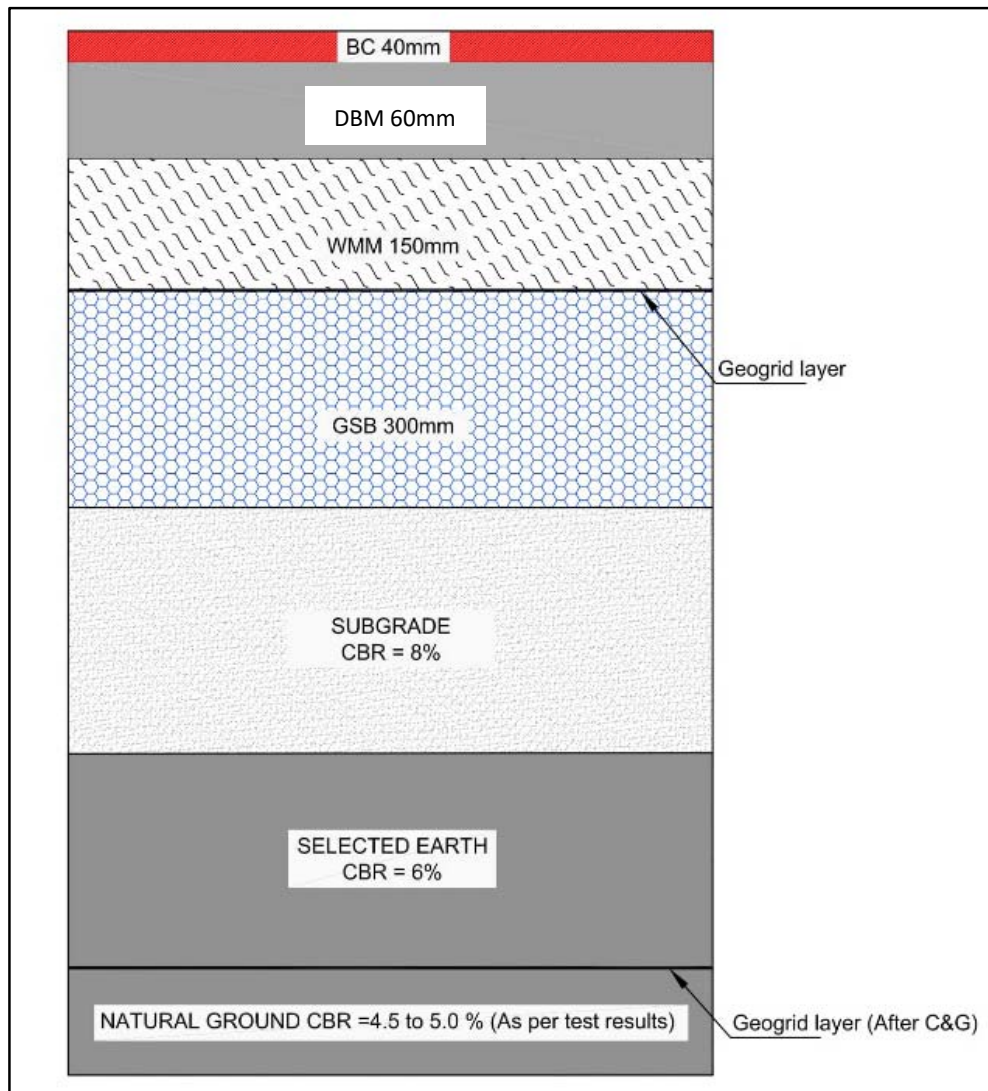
Flexible Pavement cross section with Geo grid provision
